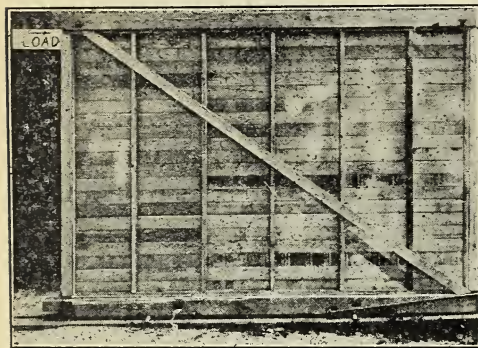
Test panel consisting of sill and plate with studs spaced about 2 feet apart and covered with 6-inch drop siding, each board being secured with two nails at each stud. The 1 by 4 inch diagonal brace made the panel three times as rigid and strong in the plane of the wall as it was without the brace
